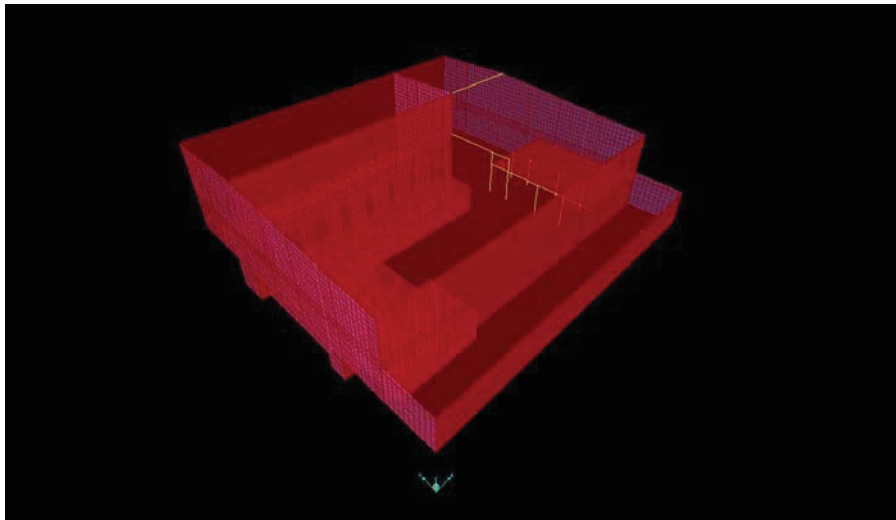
View of the Design Model with Roof and Roof Trusses Removed
